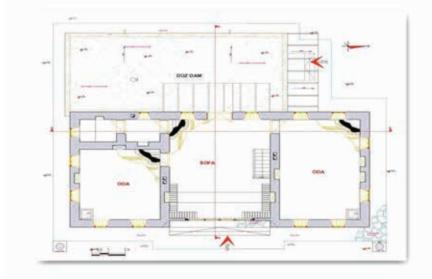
Mehmet Emin Paşa House Upper Story Layout (Ş. ÖZTÜRK)
